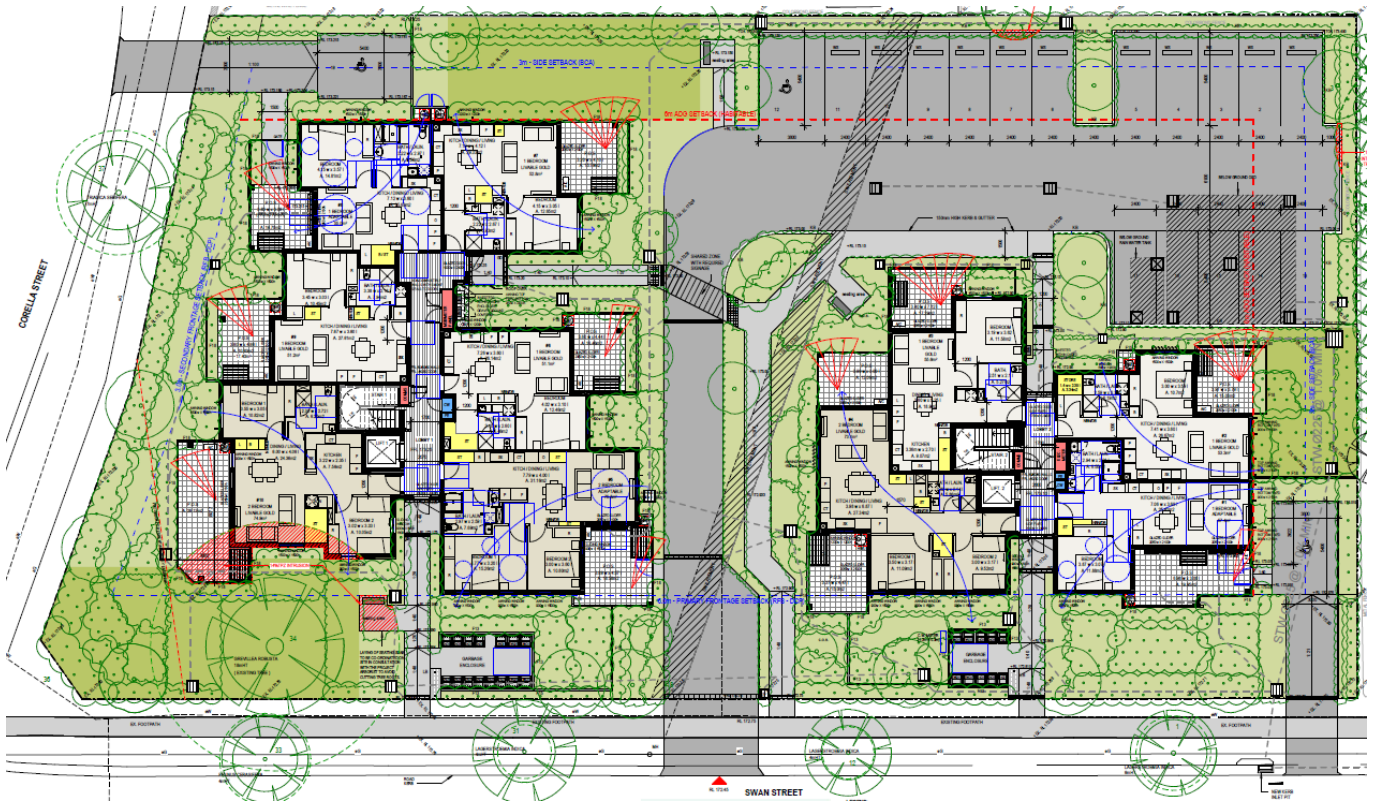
Extract from Architectural Plans – Ground Floor Plan (Source: Architectural Plans, Brewster Murray Pty Ltd, dated 7/02/2025)
